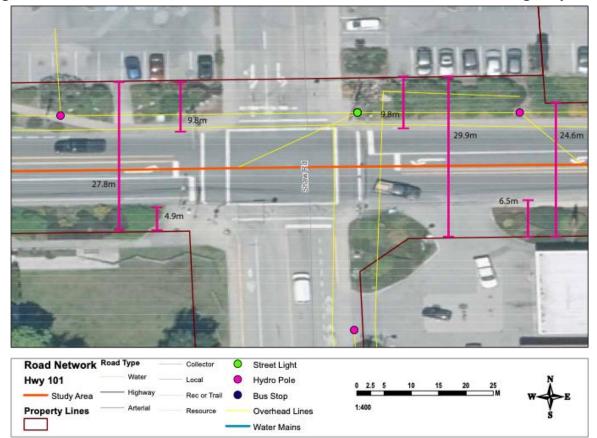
Plan View of the intersection of Shaw Road and Sunshine Coast Highway
